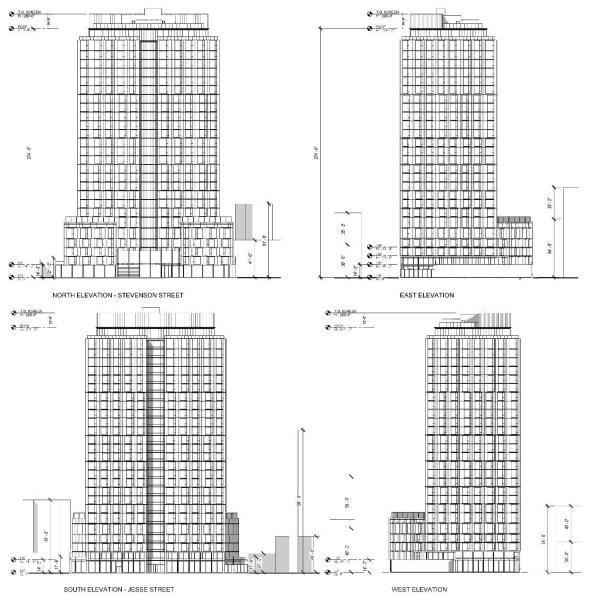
Proposed elevation drawings prepared by SCB, 2022.
